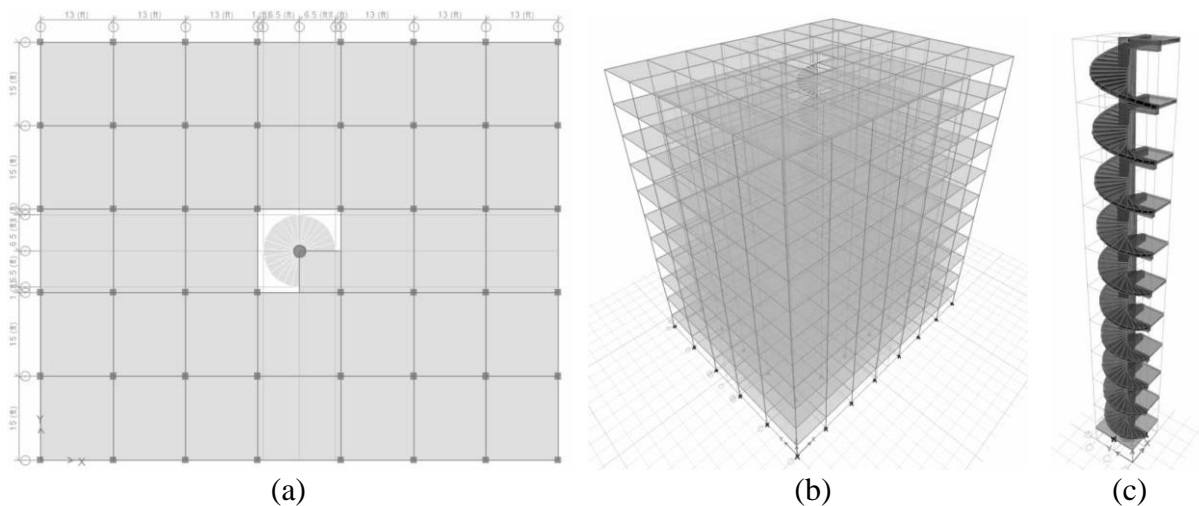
(a) Plan view of 10 story building with spiral stair, (b) Three-dimensional view of 10 story building with spiral stair, (c) Three-dimensional view of 10 story spiral stair
